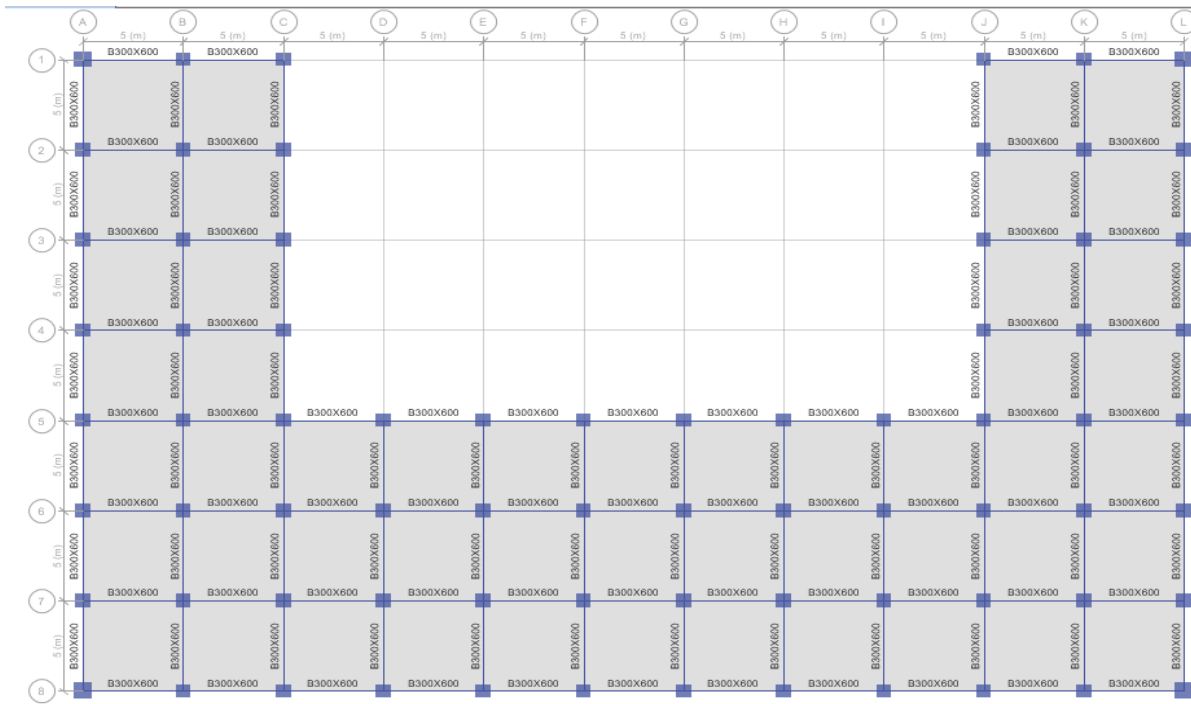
Unsymmetrical structure plan upto storey 8.
